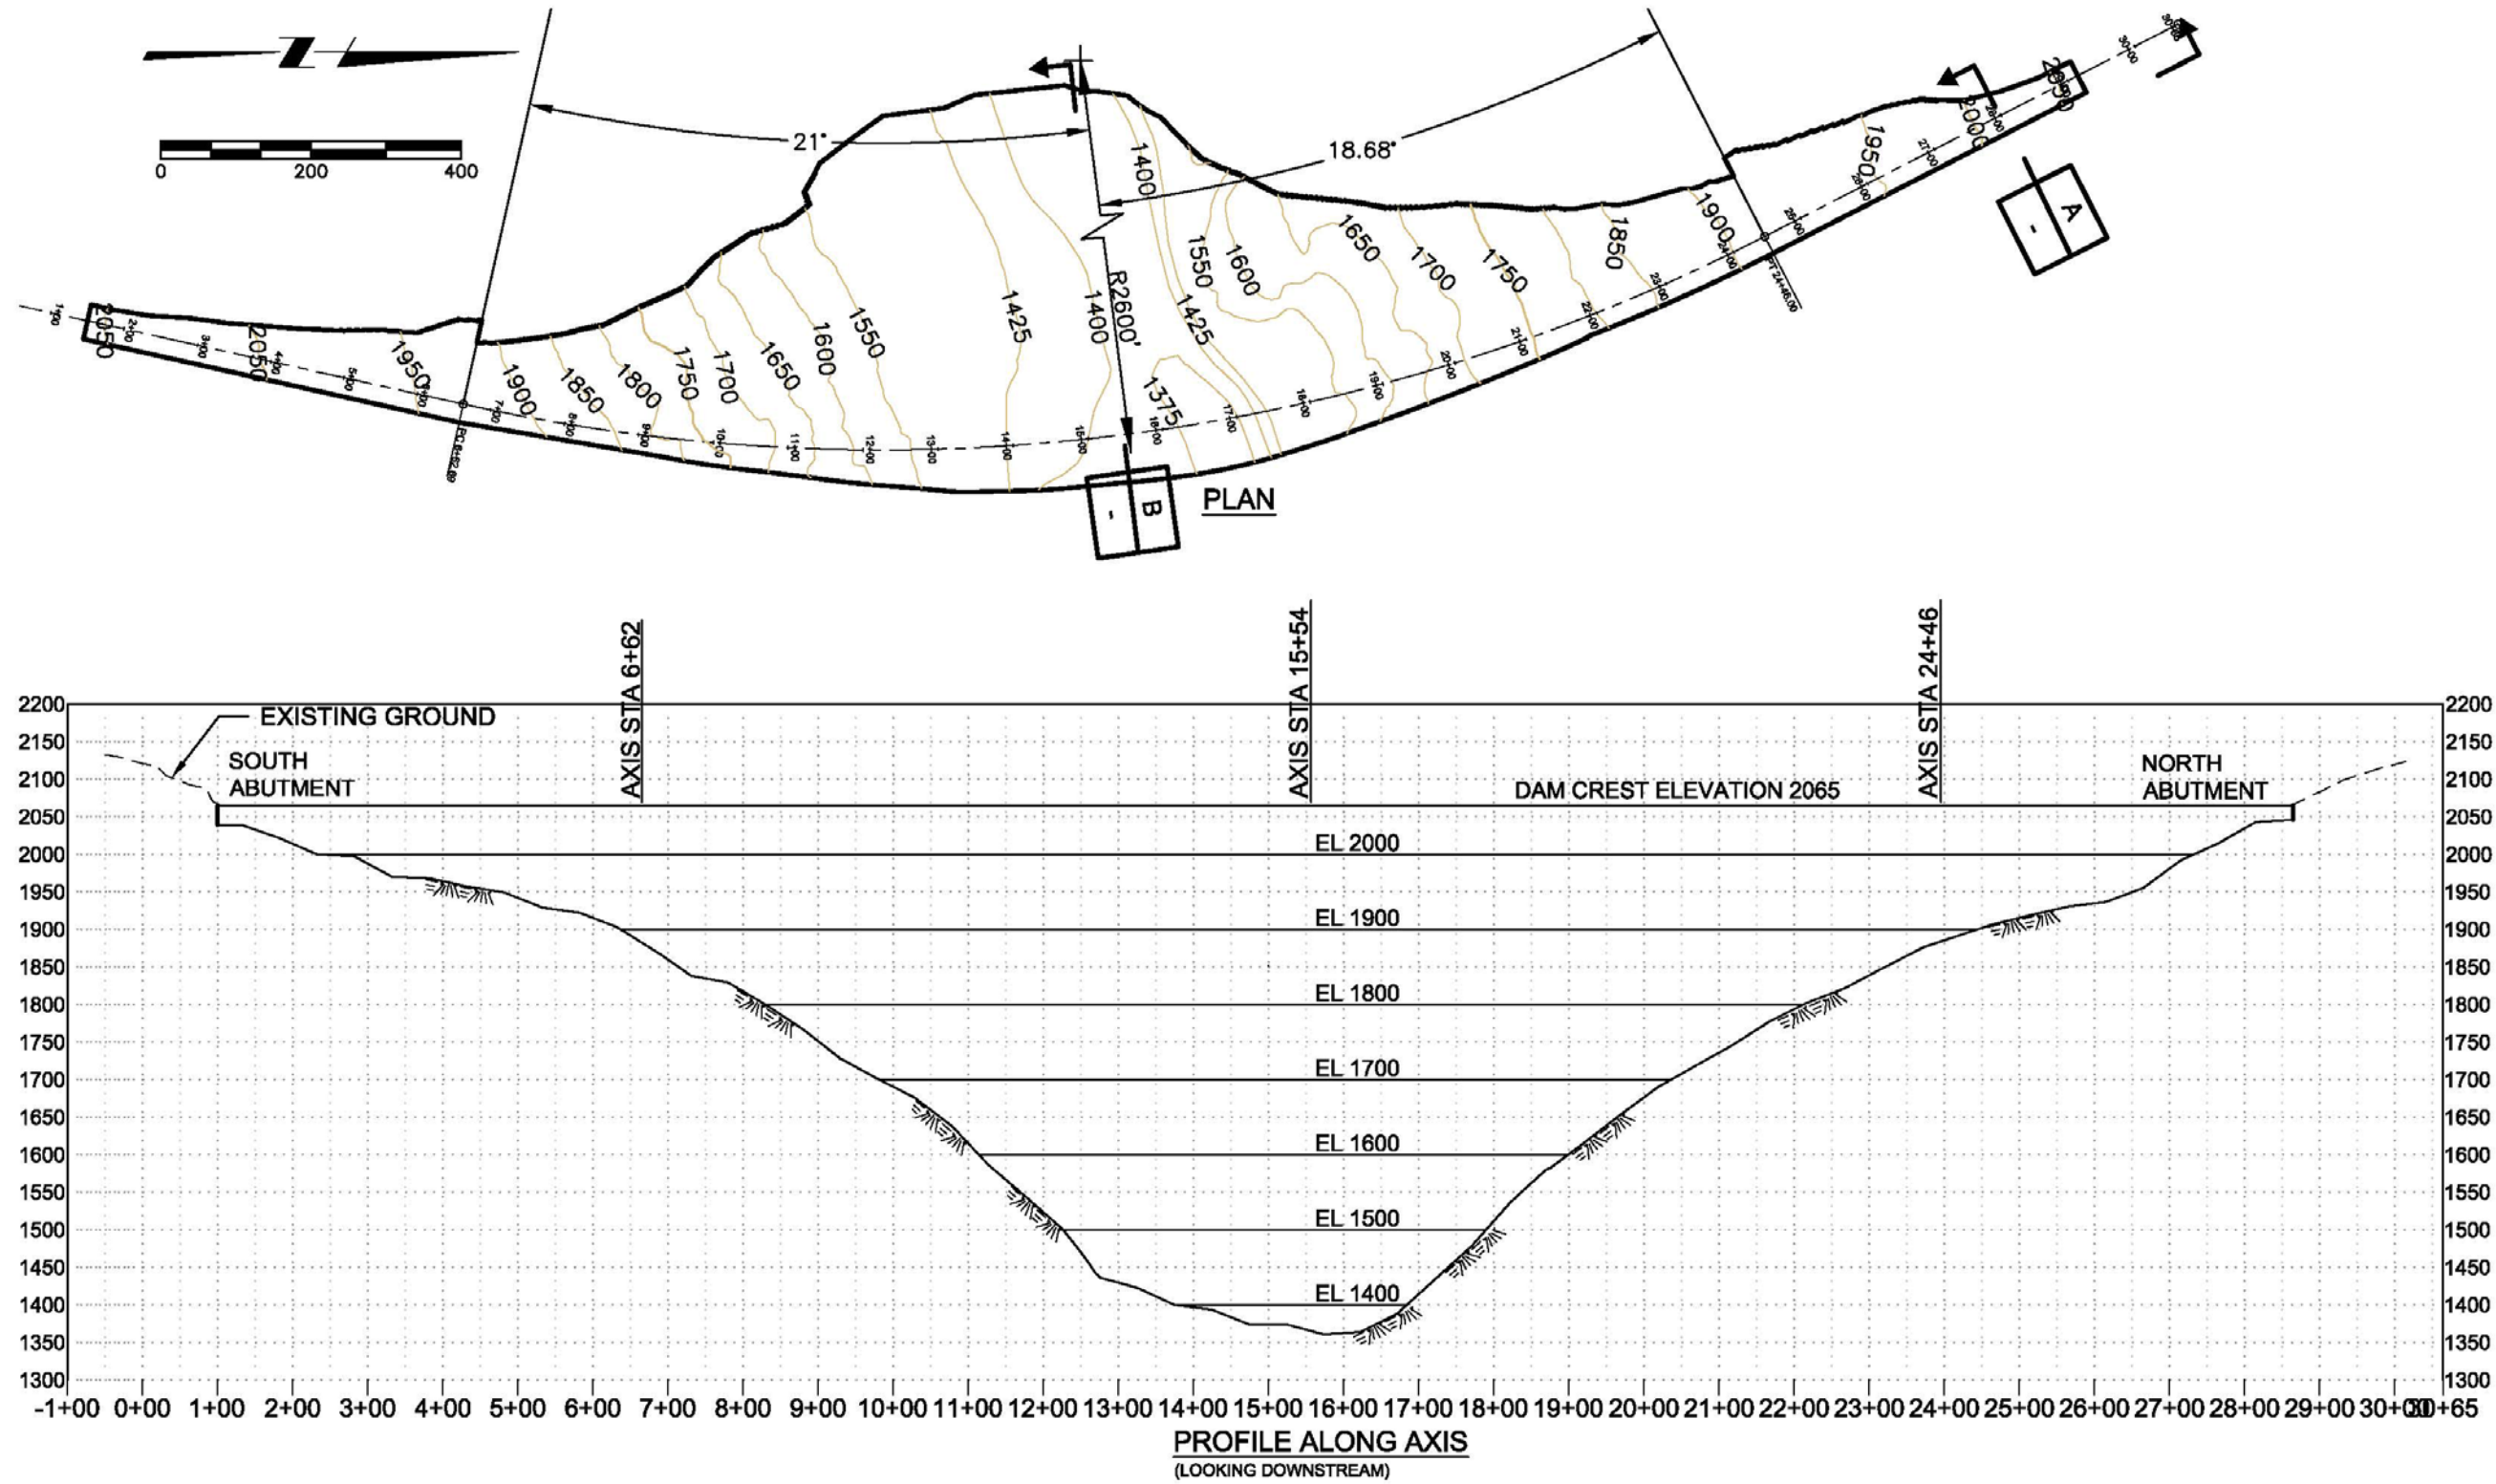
Plan and Elevation of Dam Layout 4 - Modified
